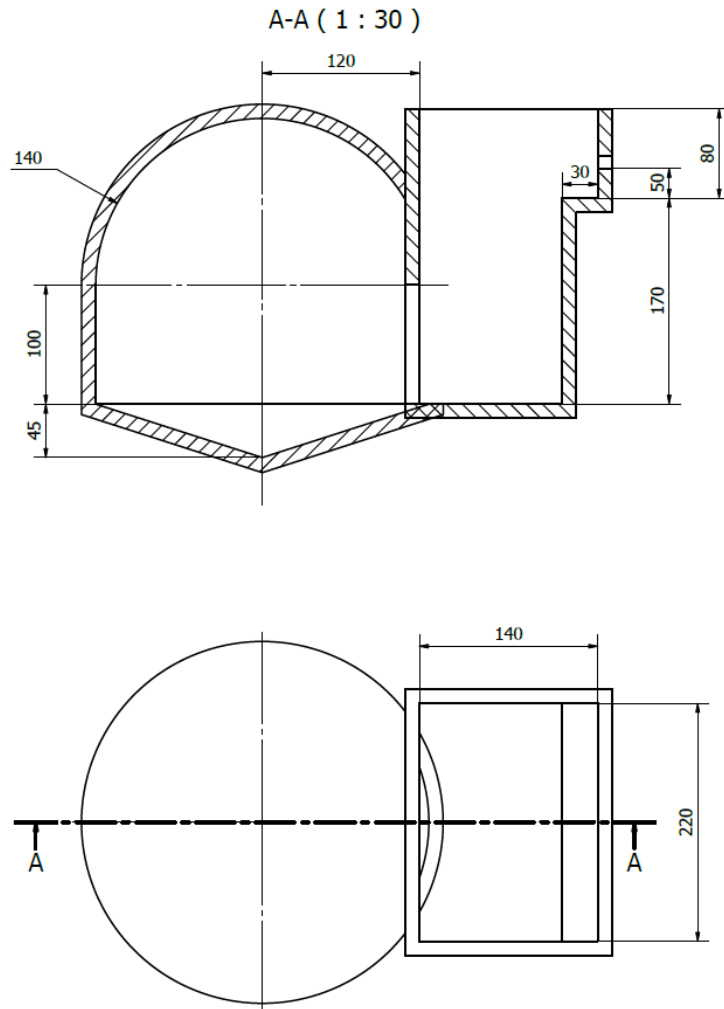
Technical drawing of the adjusted design of the fixed-dome digester
